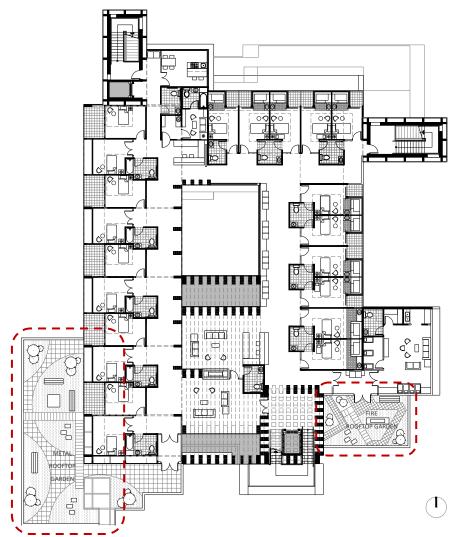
26. Plan Level 2 – Metal Rooftop Garden and Fire Rooftop Garden
